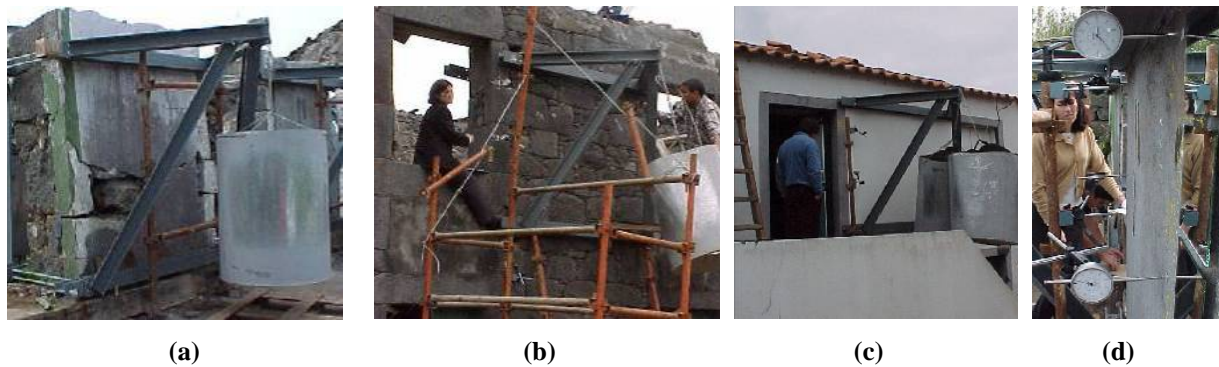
In-situ* test setup used by Costa [6]: (a) site 1, (b) site 2, (c) site 3, (d) monitoring devices.
